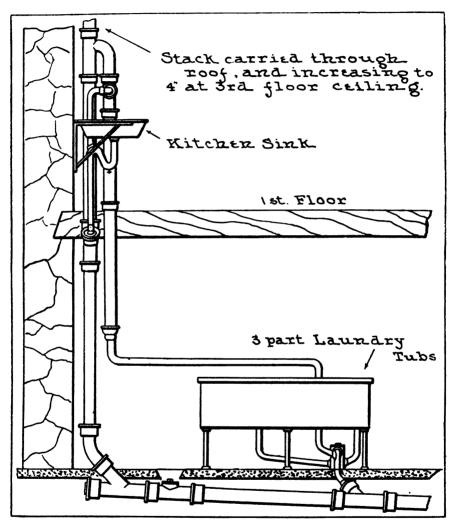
Elevation of Kitchen and Laundry Fixtures.
